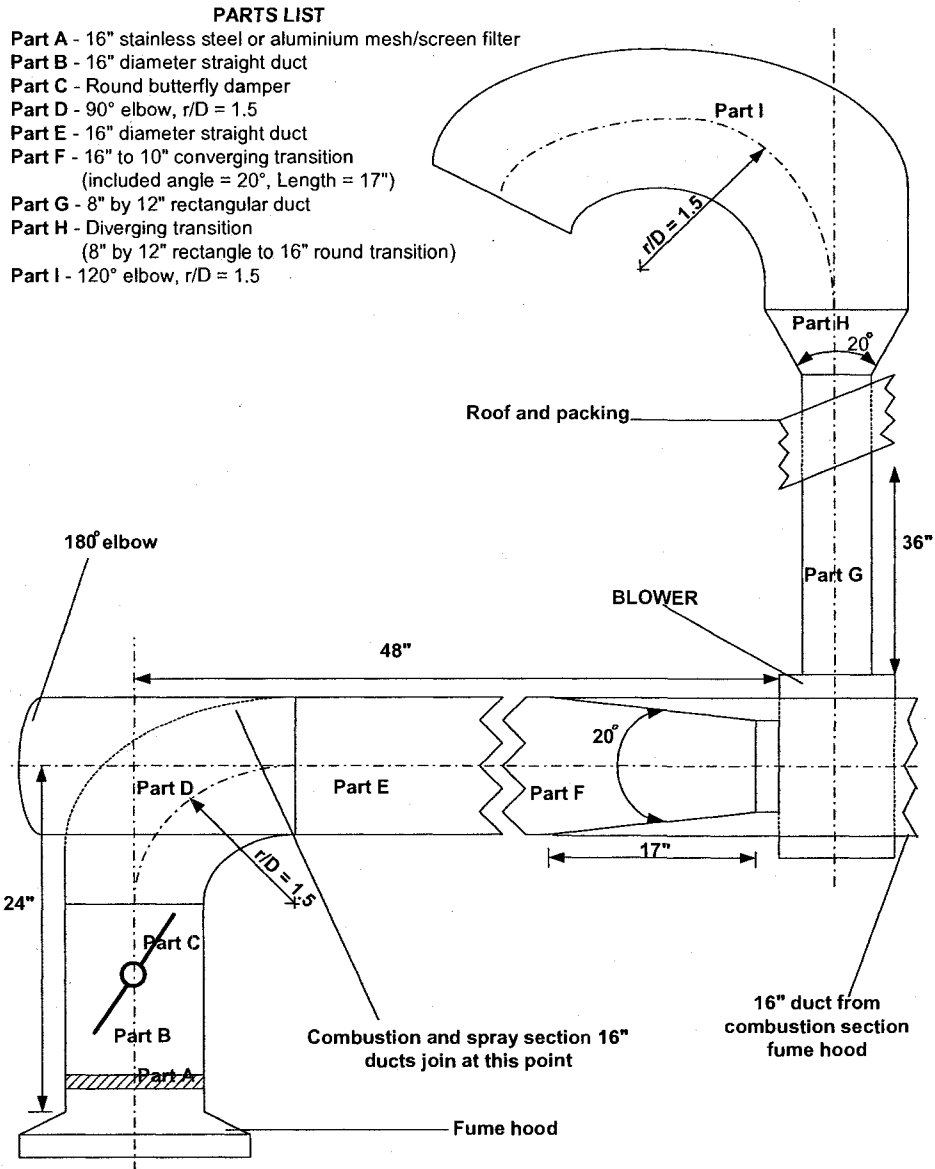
Proposed ventilation duct layout for the spray facility.
